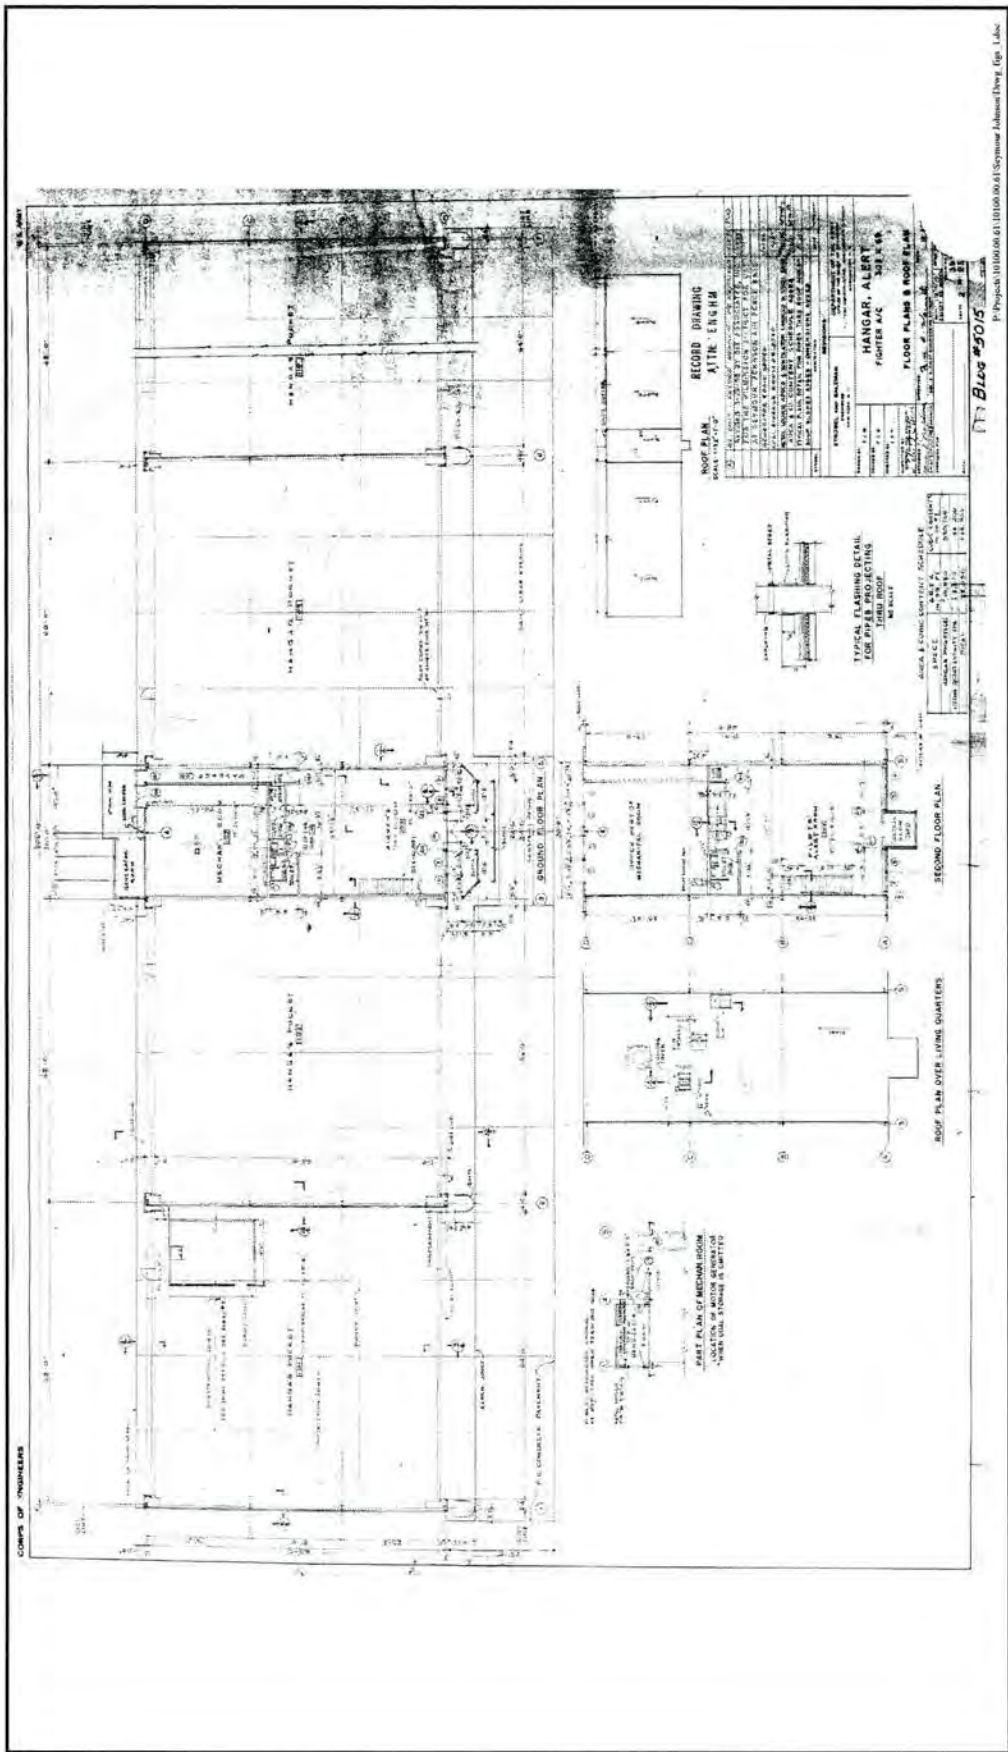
Building 5015—record drawing, floor plans and roof plan, 1951 (Source: Seymour Johnson Air Force Base Civil Engineering Vault).
